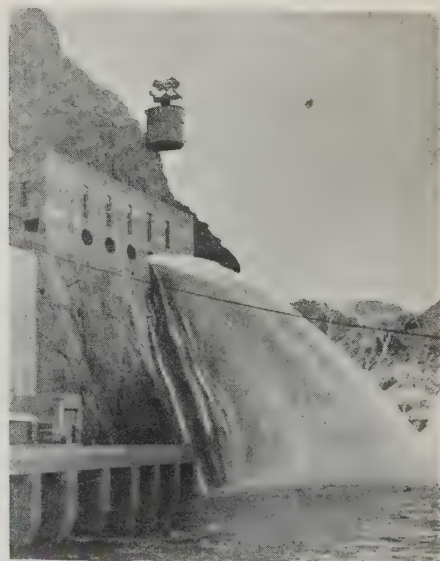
Lowering 55,000 kva transformer completely filled with oil to the power plant in Boulder Canyon
